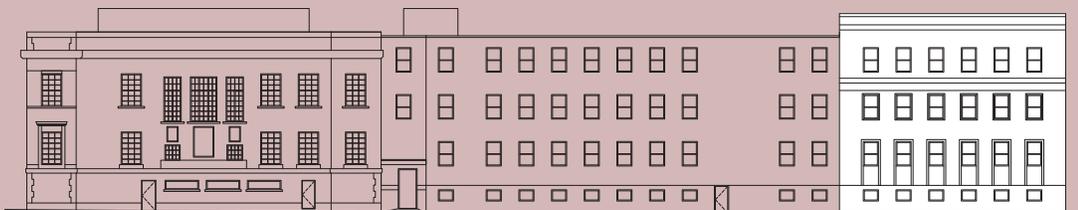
\_ South Elevation, Facade shown as of 2020
